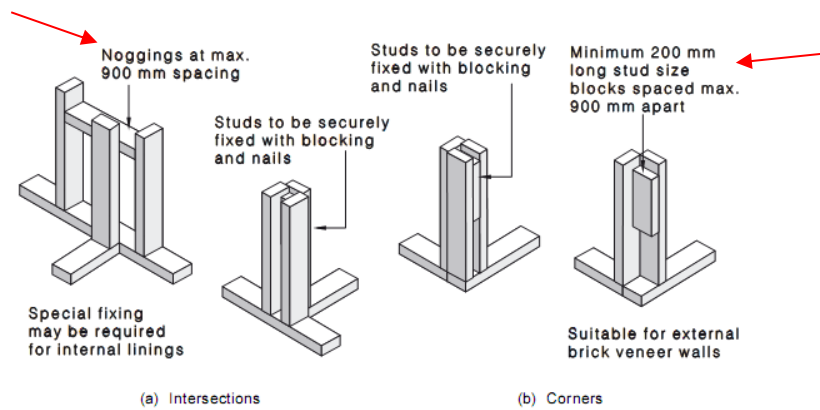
TYPICAL WALL JUNCTIONS
